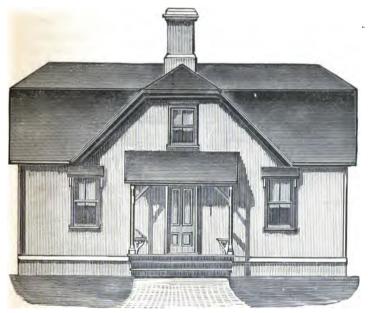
ELEVATION OF STORY-AND-A-HALF HOUSE.
